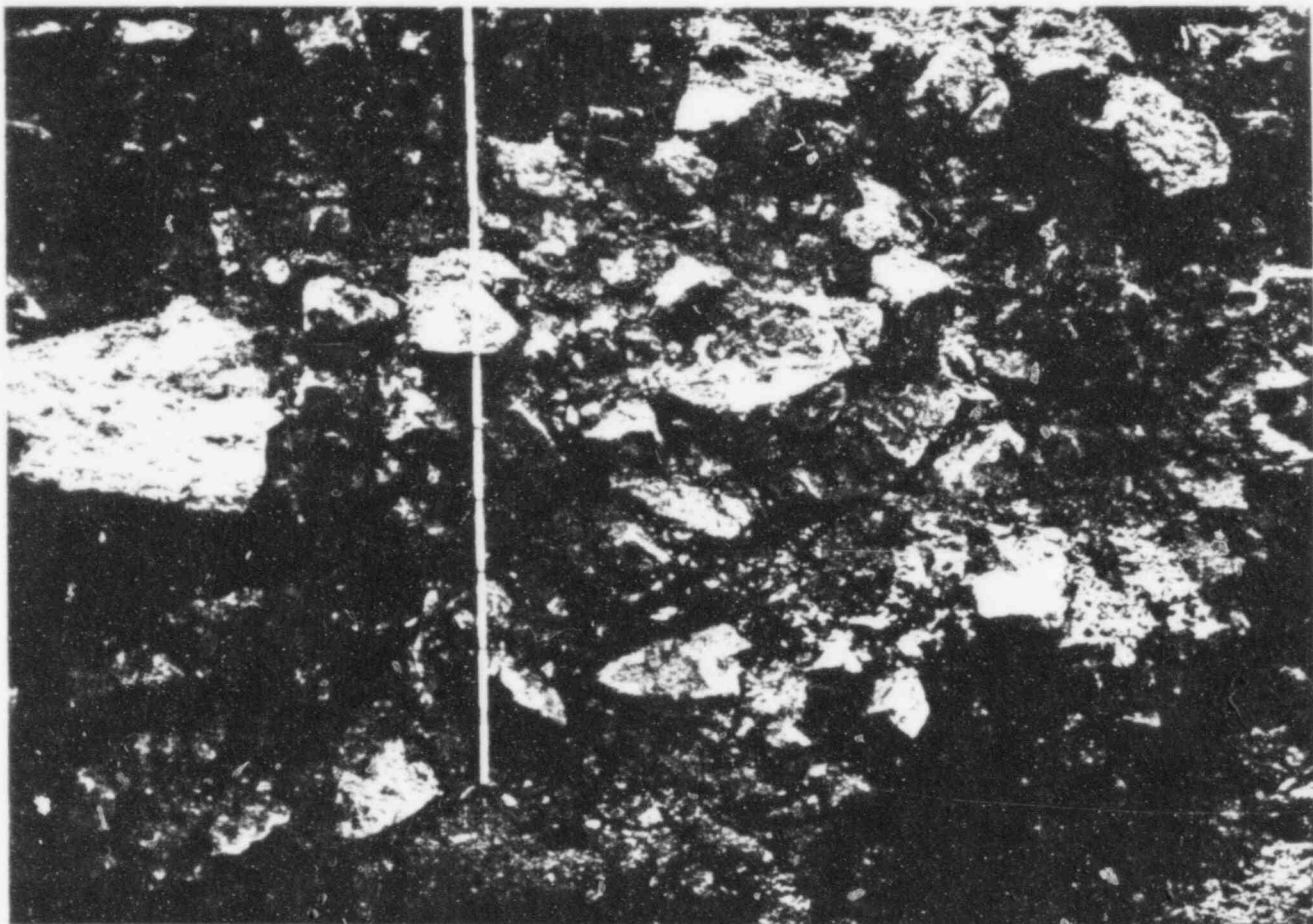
Close-up of Cross Section of Test Section VRMD-24-4-3
